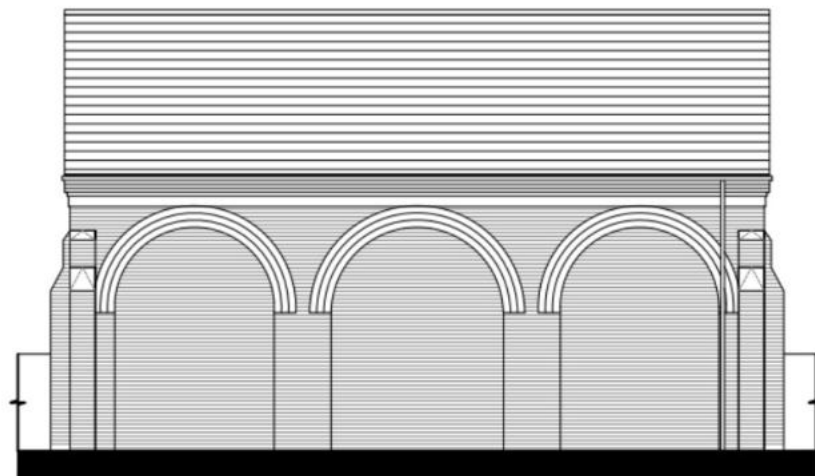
Current Existing South East Elevation Main elevation facing the railway line serving Narborough station.
